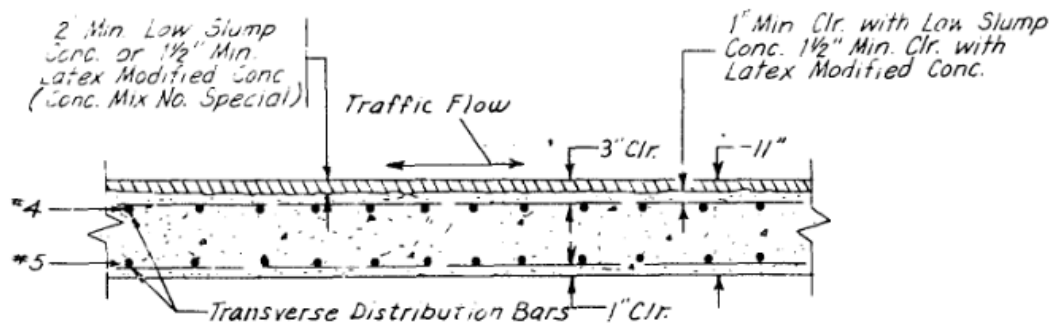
1979 deck cross section with 3" reinforcement cover to top bars. A 2017 concrete cover survey found 3.75" average concrete cover revealing that the concrete wearing course was much thicker than originally planned. This construction phenomenon is actually quite common.
